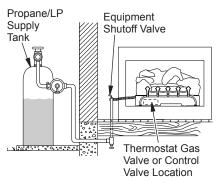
Checking Gas Joints (Propane/LP Gas Only)
